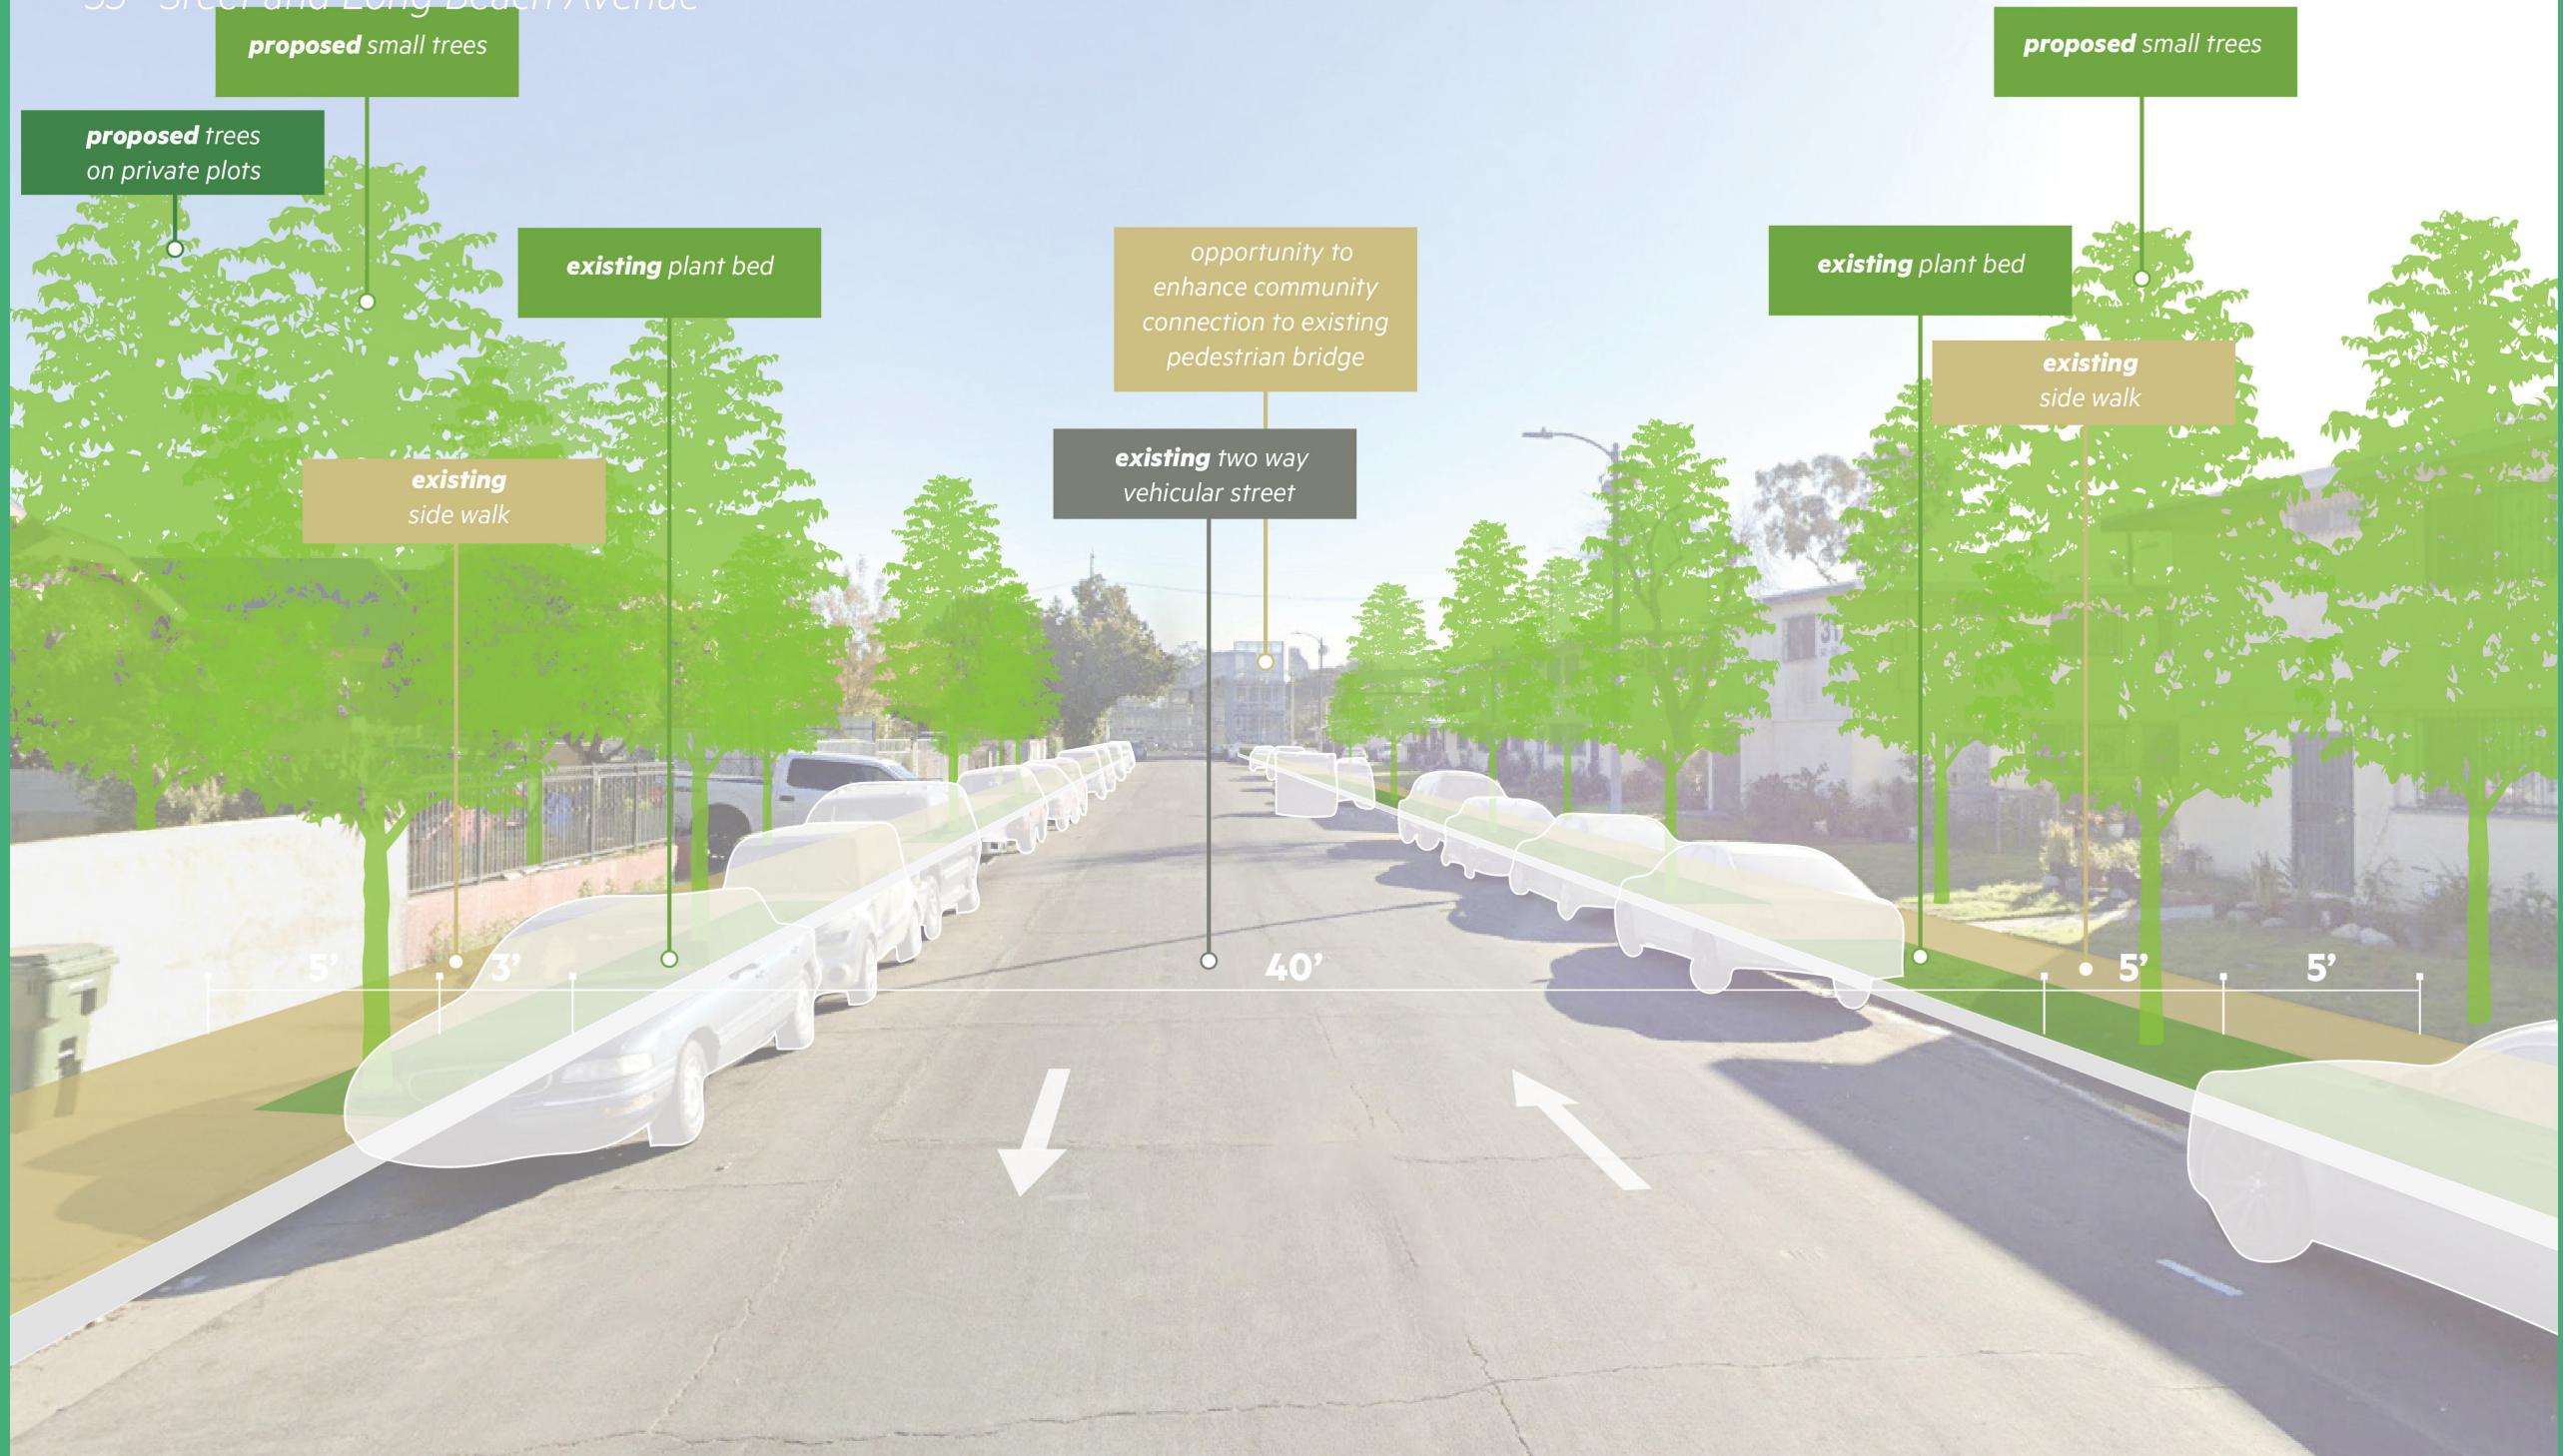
53rd Street and Long Beach Avenue, proposed design diagram, Tier 1 and Tier 2
